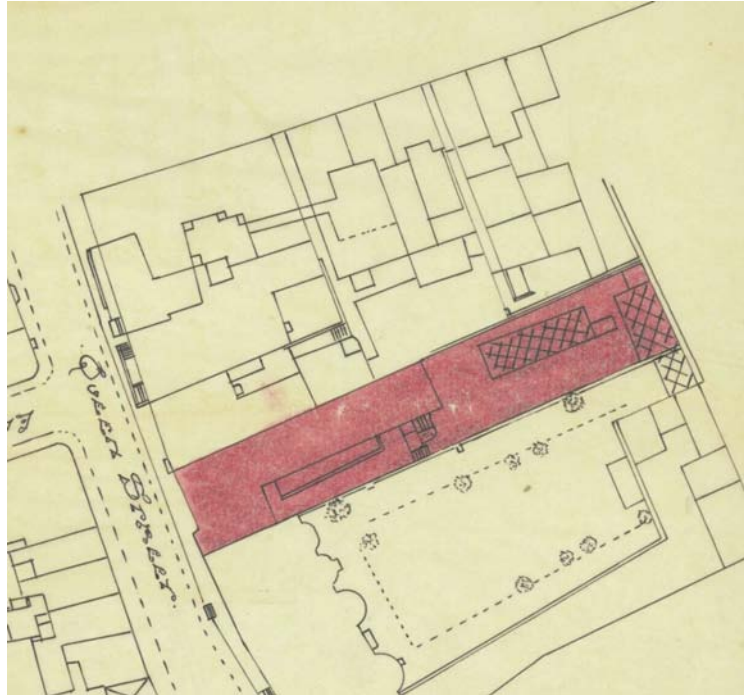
The site in 1896 – an extract from the Building Byelaw Plan.
